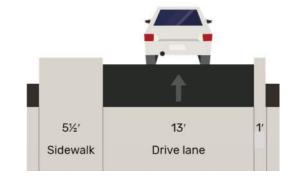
JUNKER STREET CROSS-SECTION WITH EXISTING RIGHT-OF-WAY
